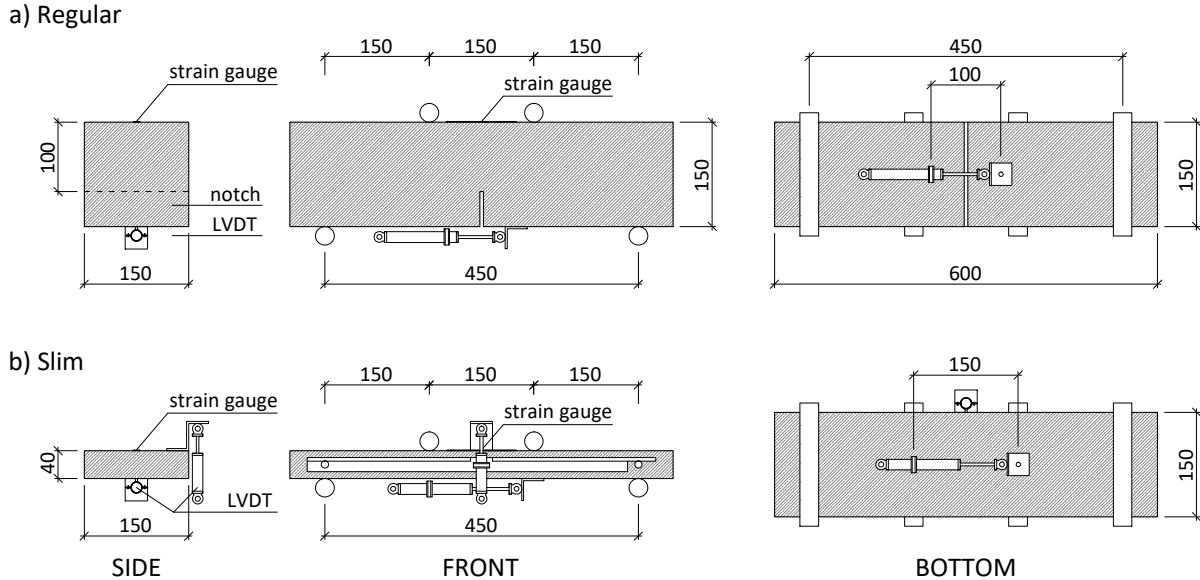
Dimensions of specimens, instrumentation and load configuration for flexural creep tests: (a) regular specimens, and (b) slim specimens.
